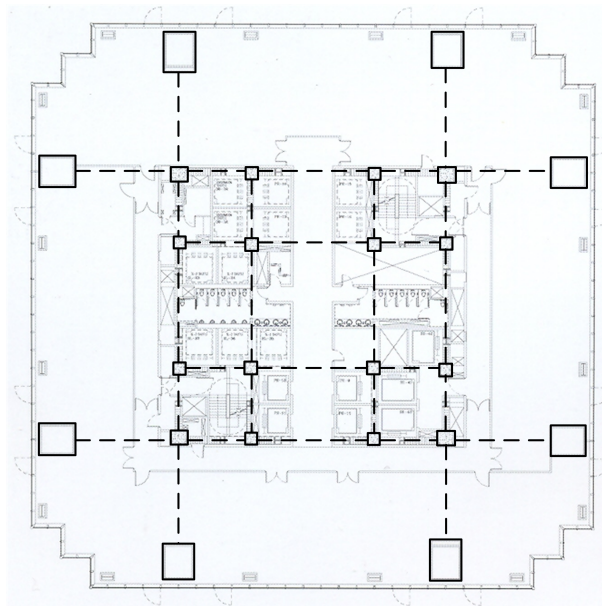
The typical floor plan of the Taipei 101, with 16 columns in the core of the building and eight super-columns at the perimeter of the building
